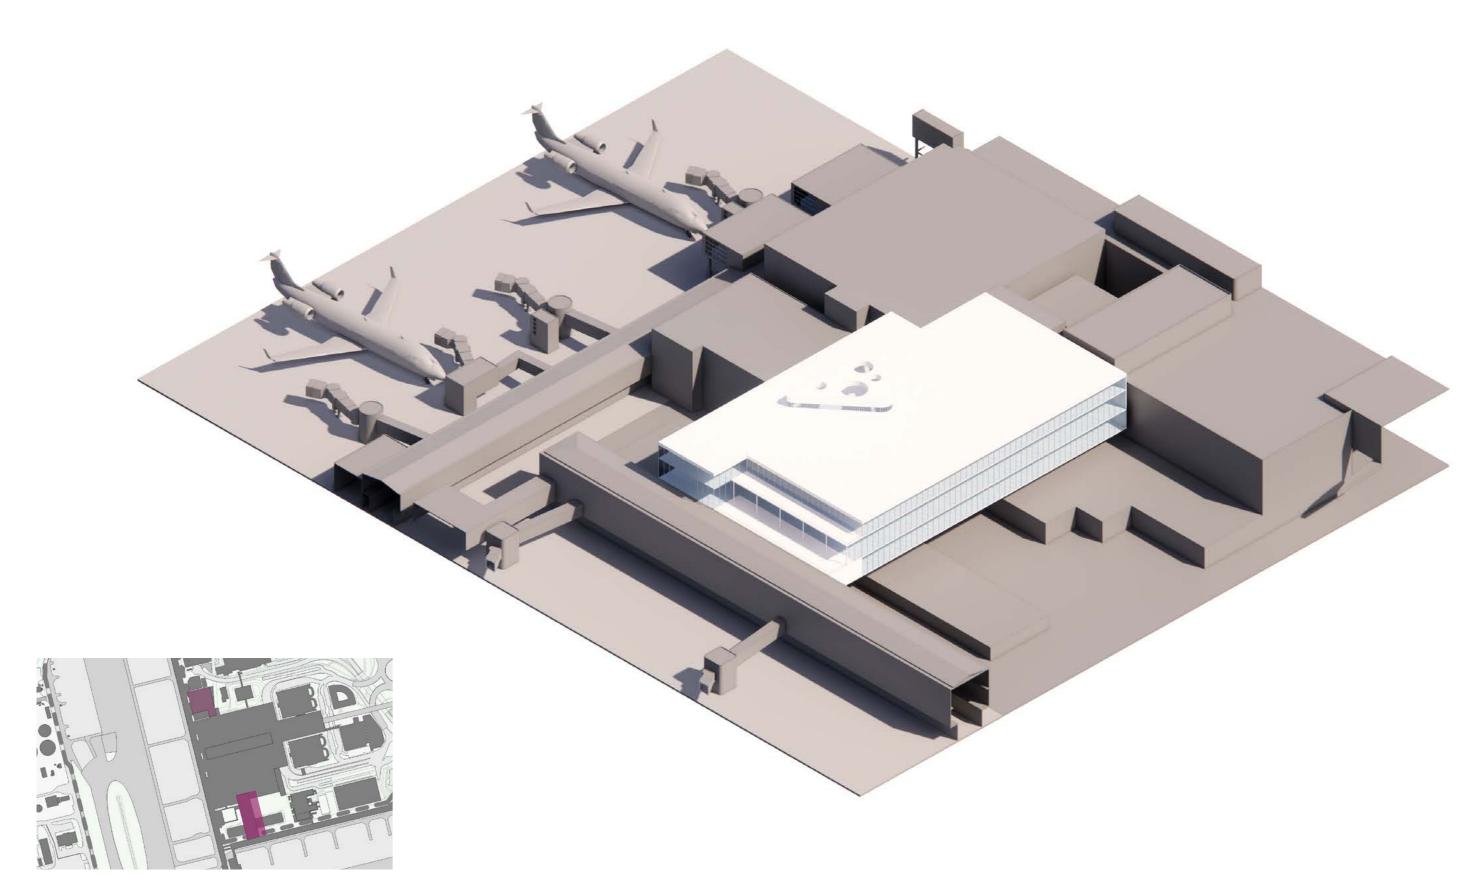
North Terminal IDL Extension (South) Site Context Plan
